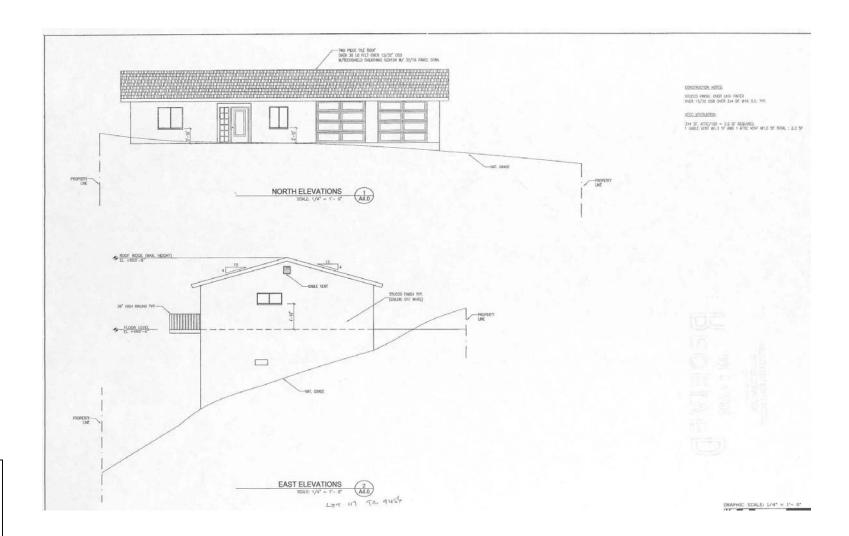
CDPA No. 4-06-001 North and East Elevations
